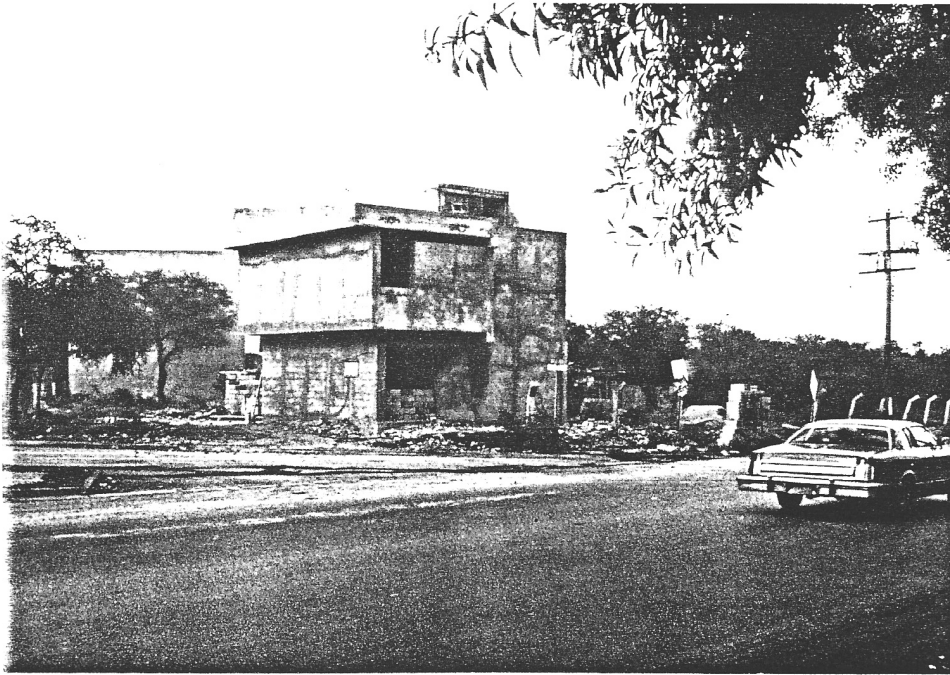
ITESM'S SOLAR HOUSE UNDER CONSTRUCTION
